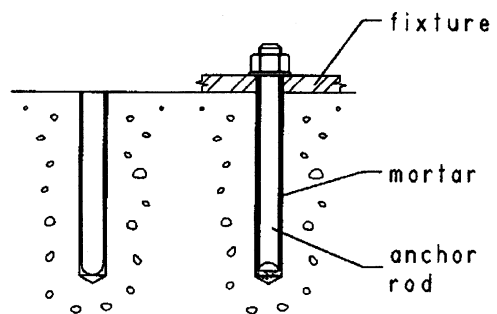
(e) — Fastening systems: bonded or adhesive anchors (left-side sketches show hole shape; right-side sketches show installed anchors)
